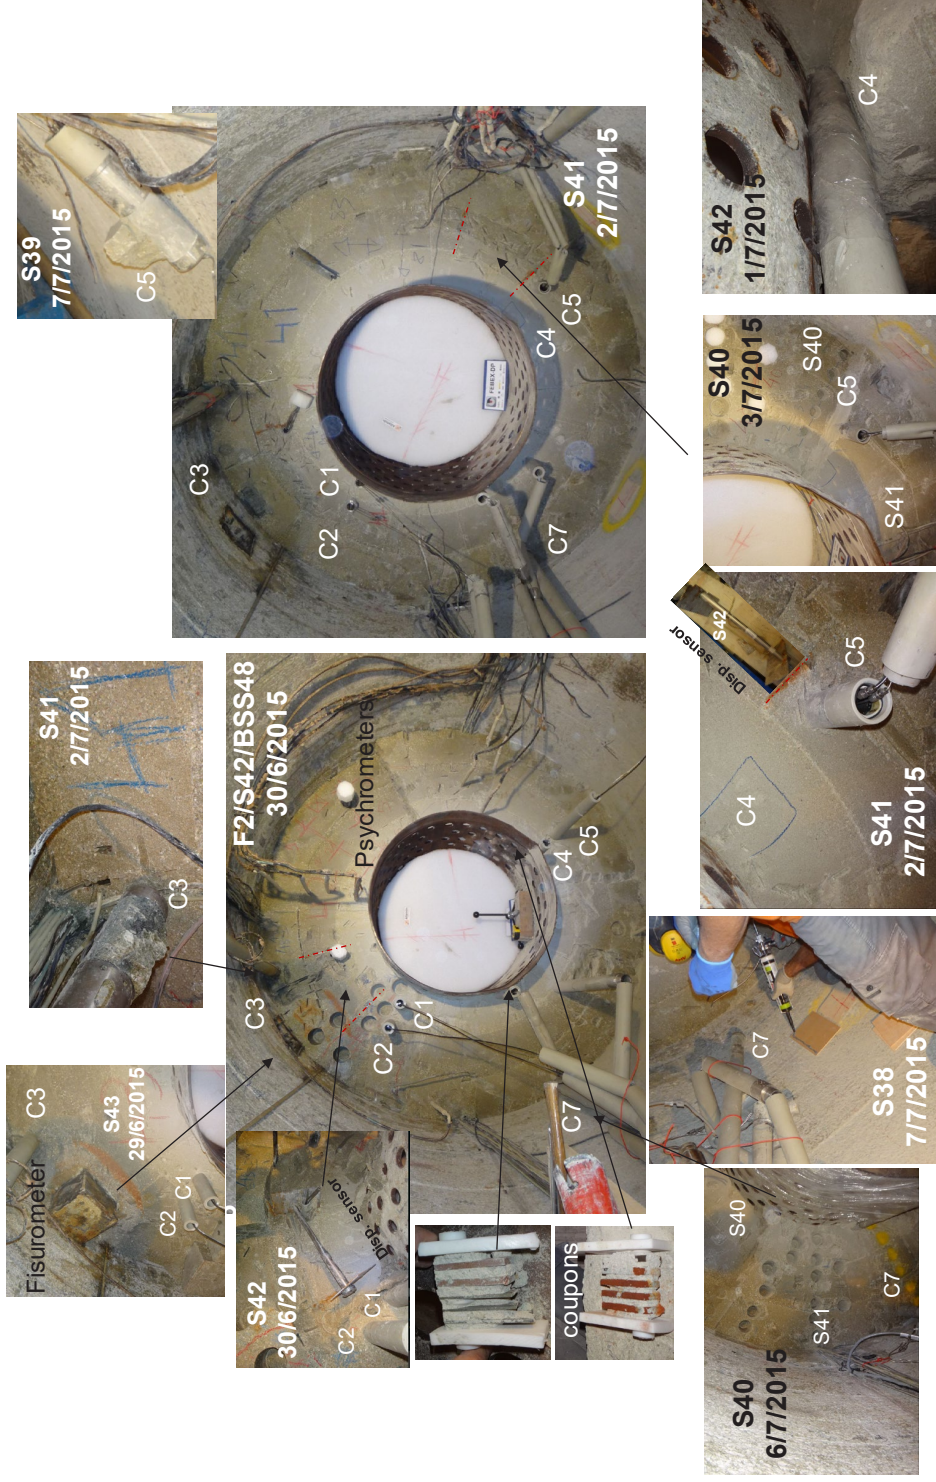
Visual aspect of the pipes at the instrumented Section F2 (S42, BSS48)
